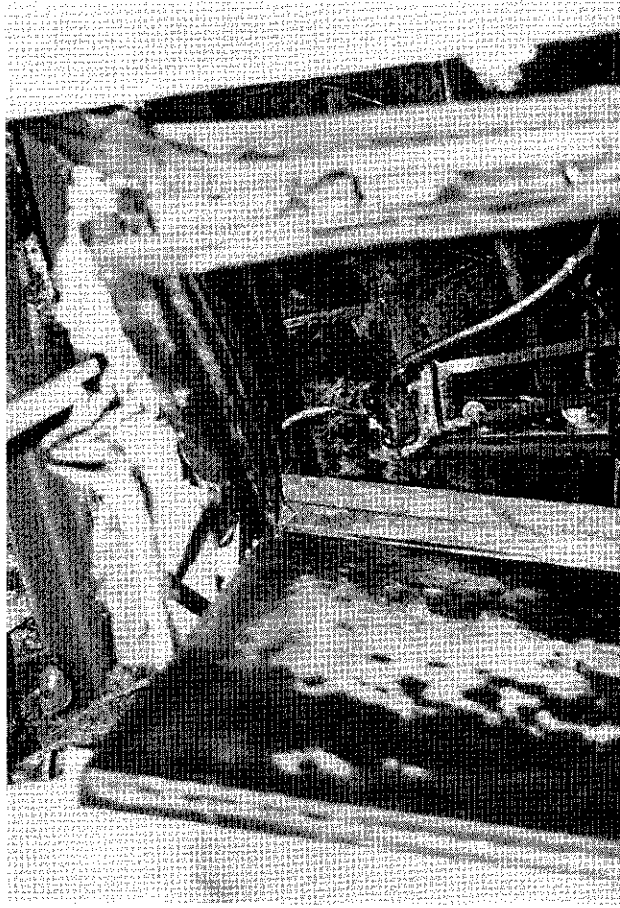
(Below) Distorted exit door frame on 10th floor as seen from South stairwell side.
